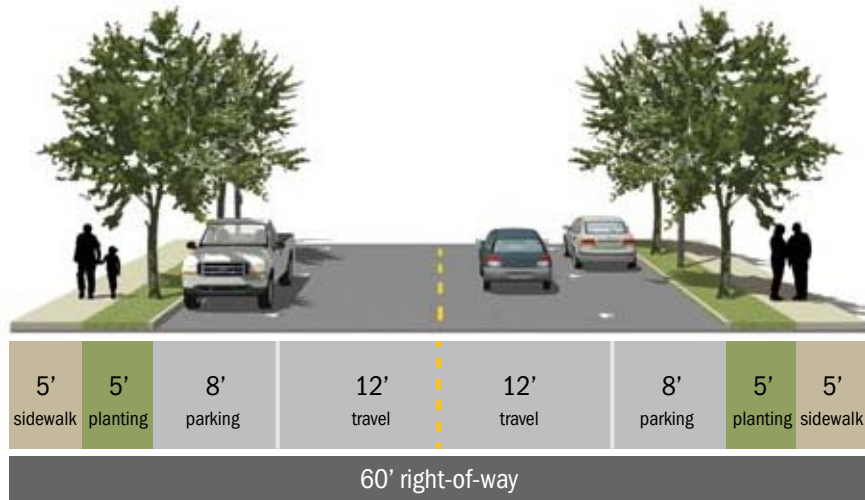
Proposed Conceptual Cross-Section for Local Streets with a 60' right of way
